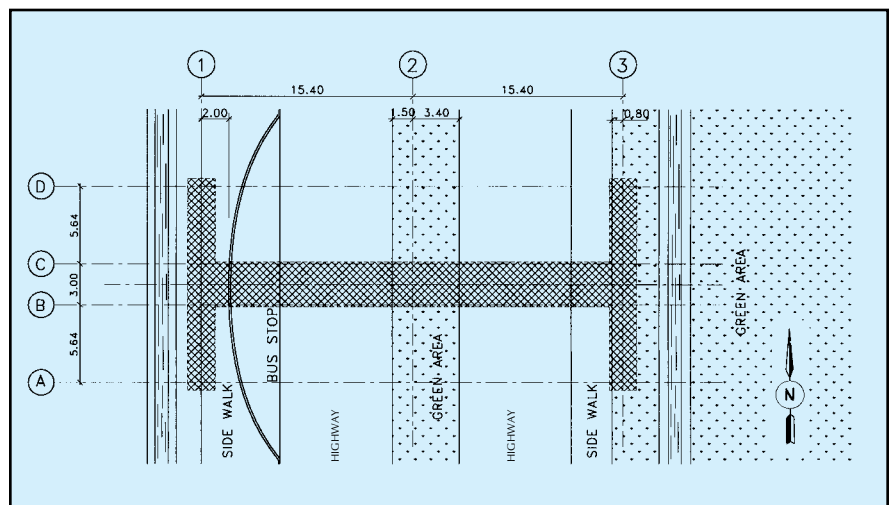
Site plan of project showing pedestrian bridge in relation to highway, sidewalk, bus stop and green area.
